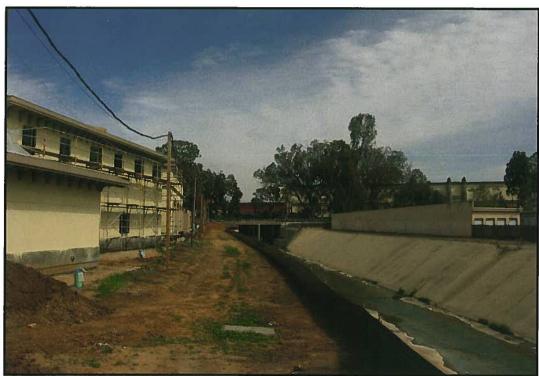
Looking east along north side of channel adjacent to Fire Station No. 1. towards CCP.
